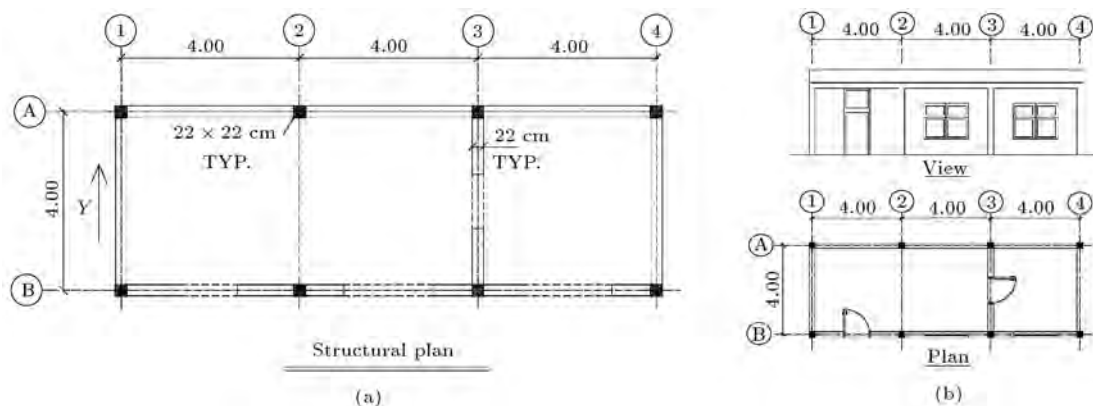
Simple CM building: (a) Structural plan; and (b) architectural view and plan.
